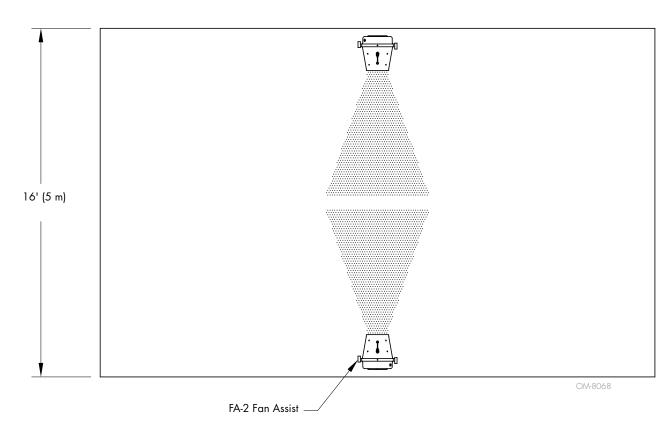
PLACEMENT OF FAN-ASSISTED (FA-2) FOR WALL OR CEILING ARRANGEMENT
